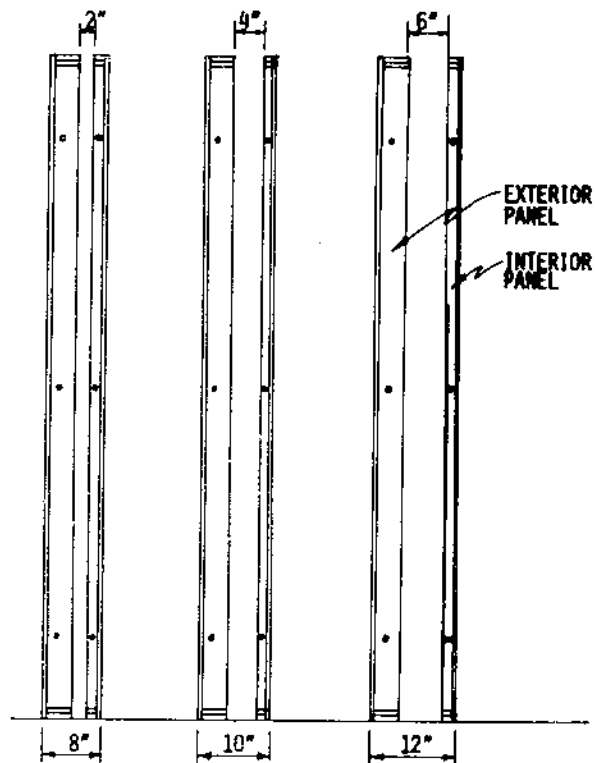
Cross section of exterior wall showing variations in panel spacing for adding insulation or for hiding obstructions.
